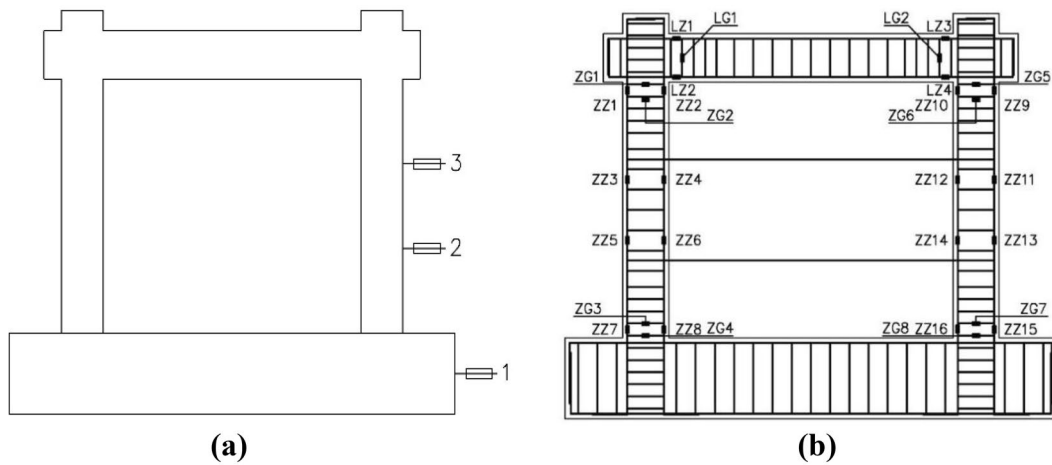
Measurement point layout. a Schematic diagram of displacement gauge arrangement. b Layout of strain gauges
